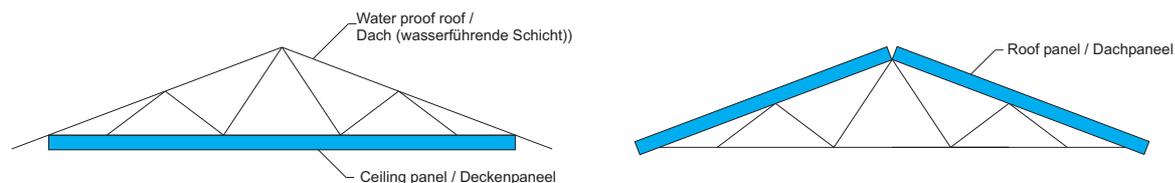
Insulated sandwich panel used in ceilings and roofs
